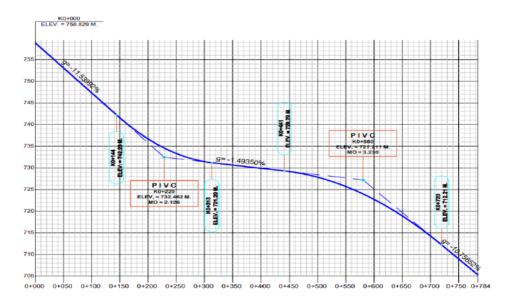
AutoCAD CIVIL 3D projection of vertical alignment for Sagonsongan diversion road
